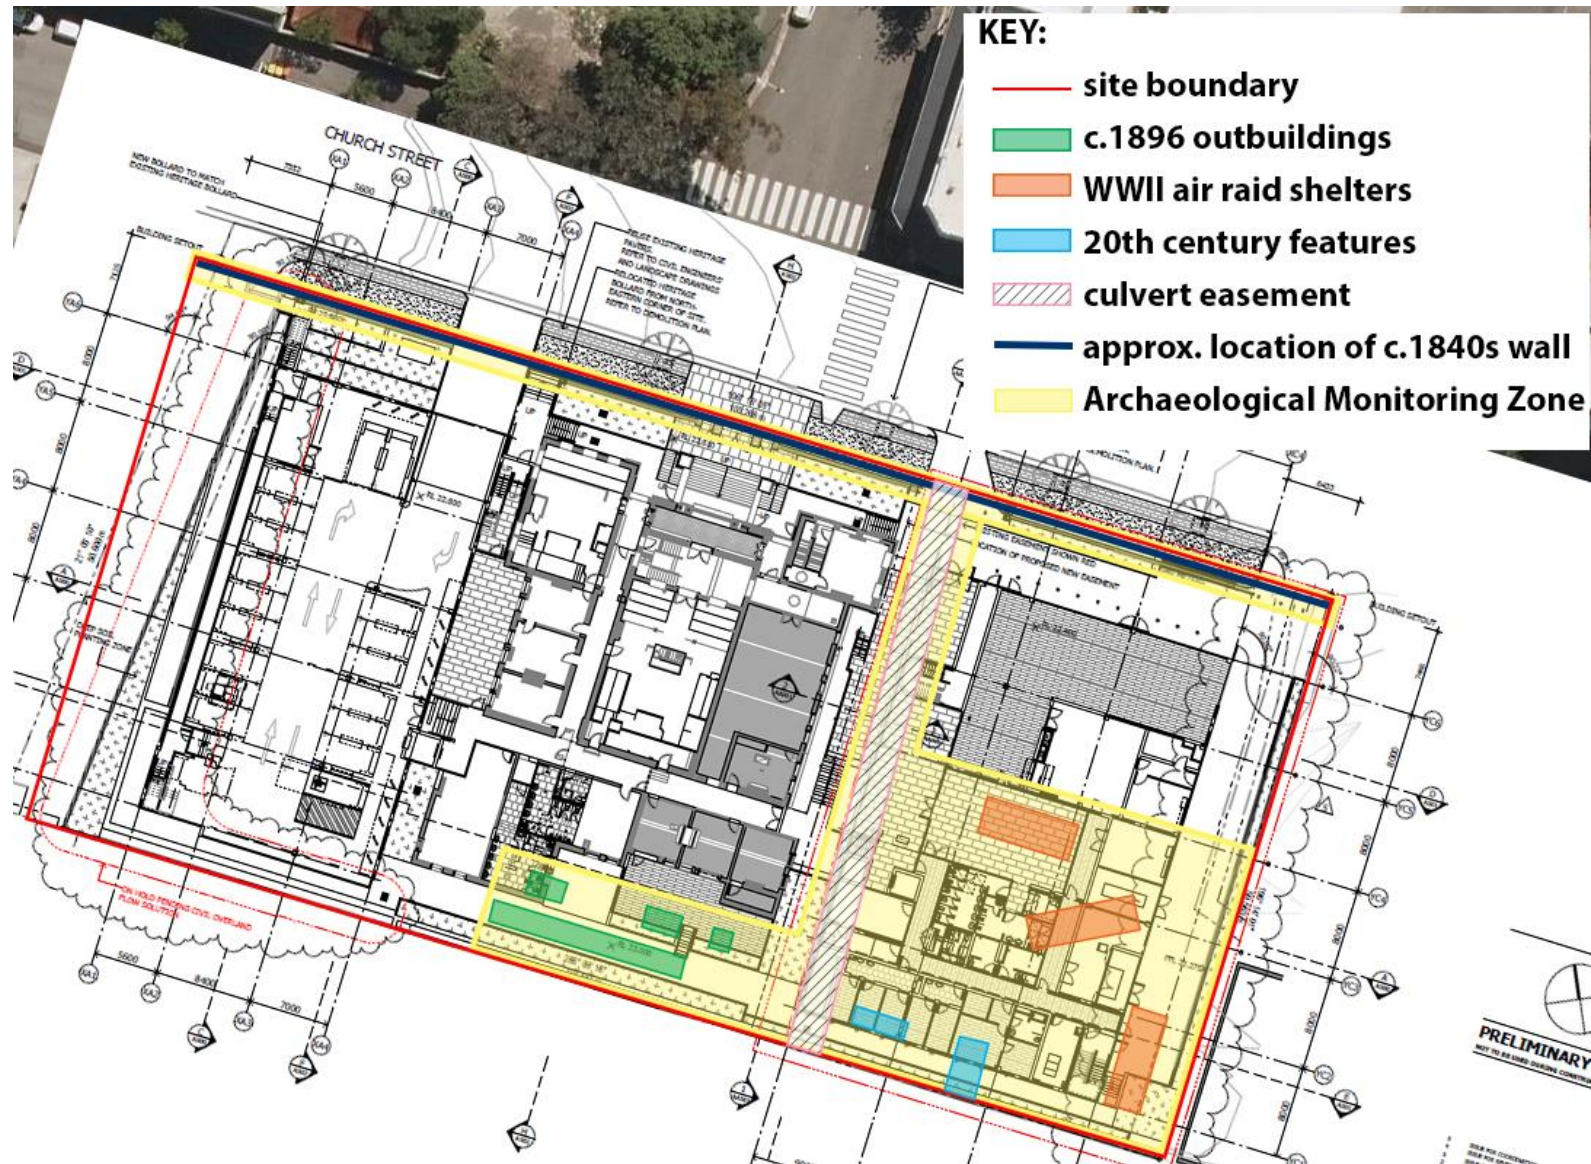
Plan showing Archaeological Monitoring Zones on general site arrangement plan. Strickland, February 2020.
